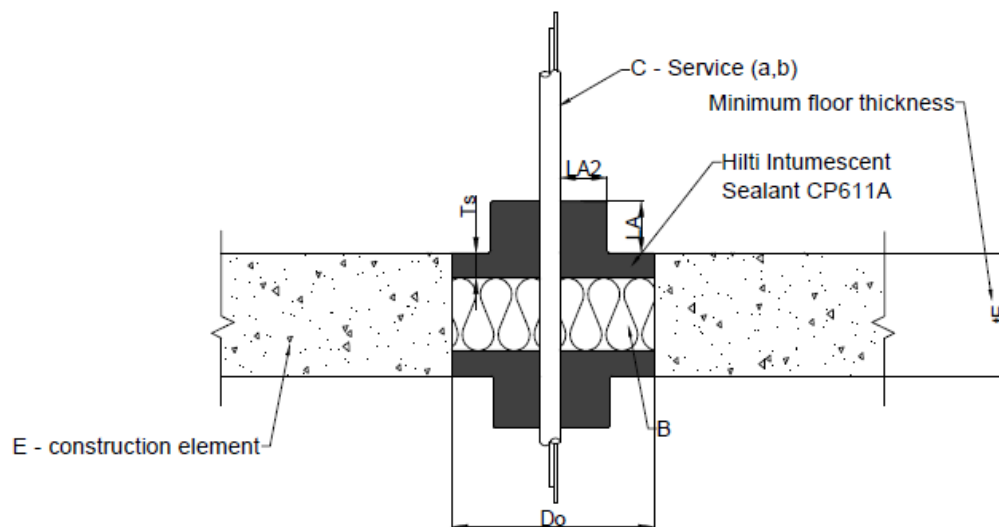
Side View, seal type 20, uPVC Conduits $16 \leq \text{Dia.} \leq 32\text{mm}$, in concrete floors
